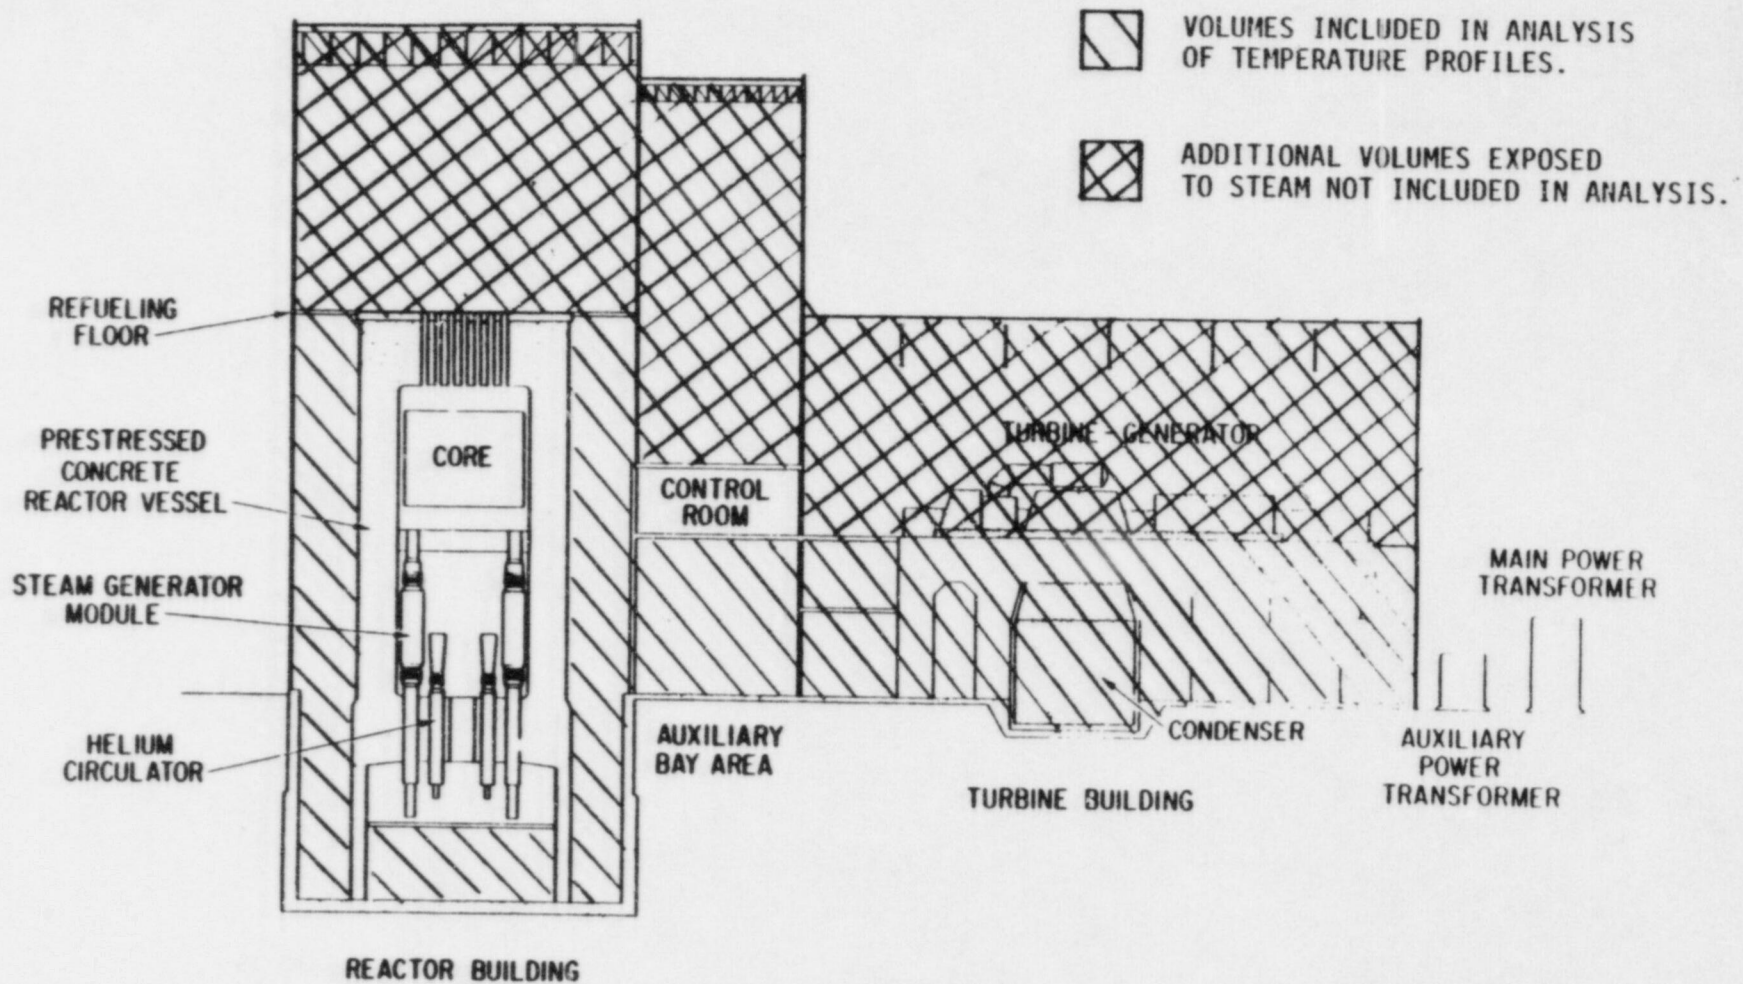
Section Through Reactor Building and Turbine Building
